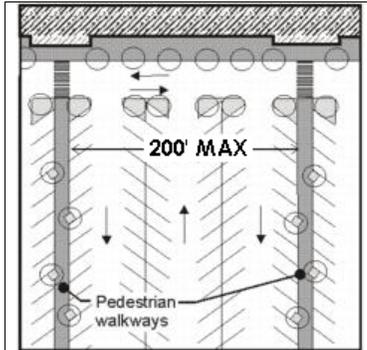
(G)(3)(b): Walkways through parking lots.
